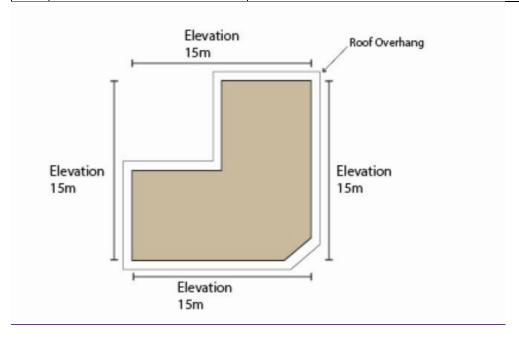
Measurement of a building elevation (Accommodation and Community Facilities Overlay).
